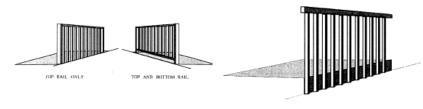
A Typical Post and Rail Systems Figure A-1.2.2.B Cantilevered Picket System
